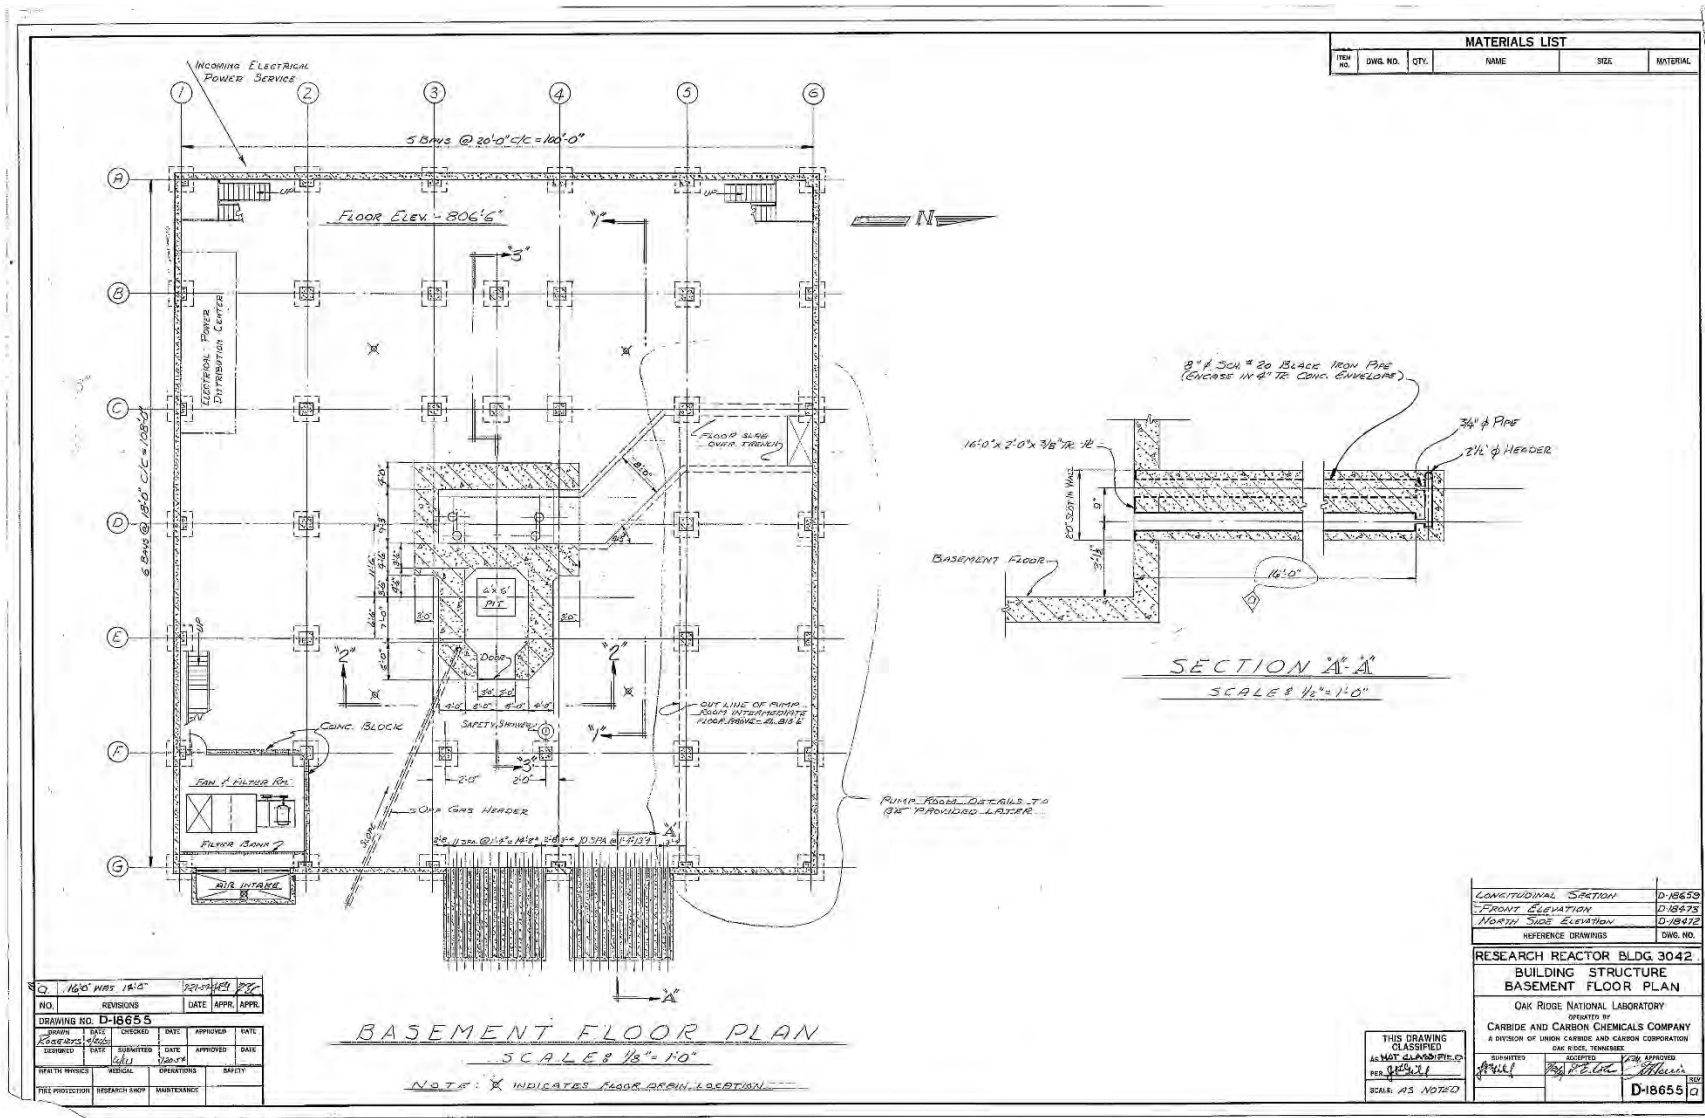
Basement floor plan for Building 3042 (Oak Ridge National Laboratory, April 26, 1954).
